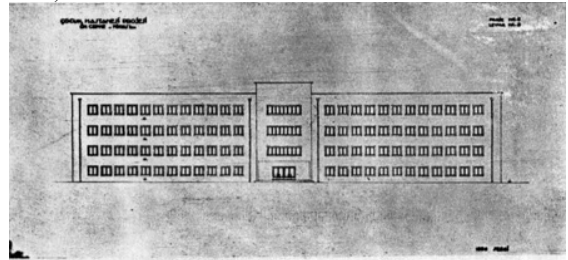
Children hospital, Front elevation and floor plan, student: Sezai Hakkı, (Anon., 1932).
